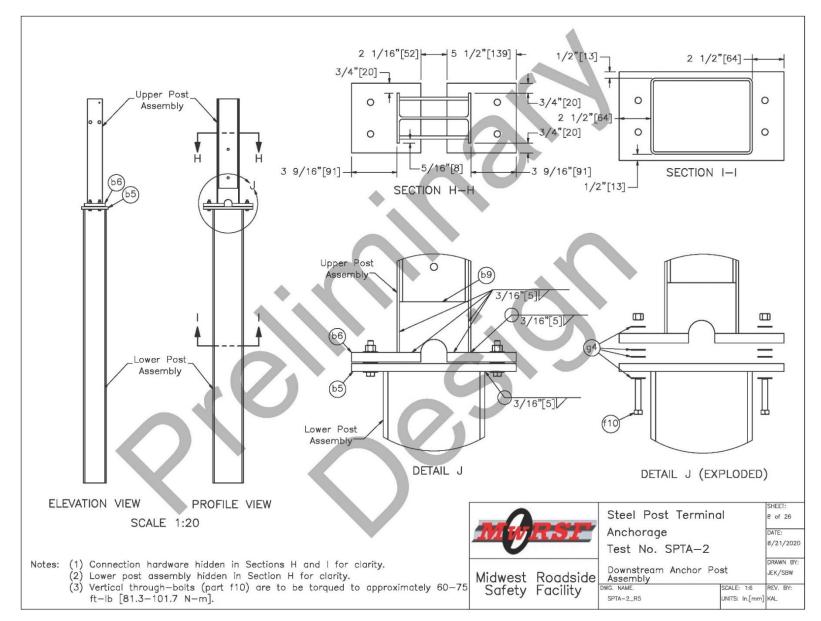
Downstream Anchor Post Assembly, Test No. SPTA-2
